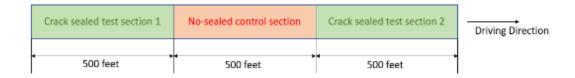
Graph. Test Site Layout with One-time Crack Sealing Applications
